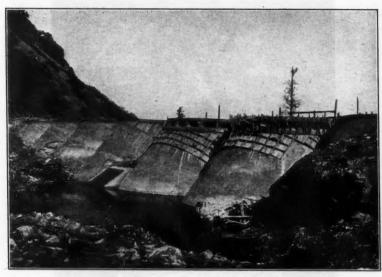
Up-stream Face of Agnew Lake Dam, Showing Spillway Openings and Inlet.
